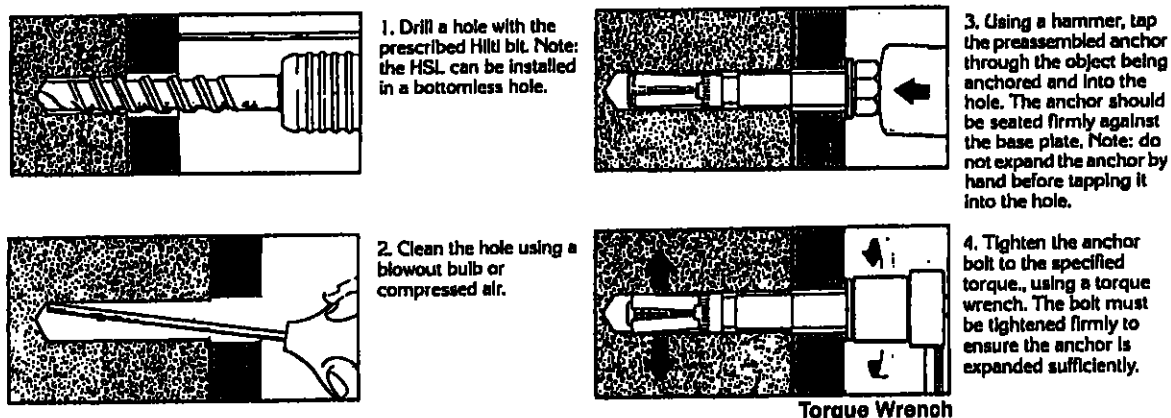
HSL INSTALLATION INSTRUCTIONS
